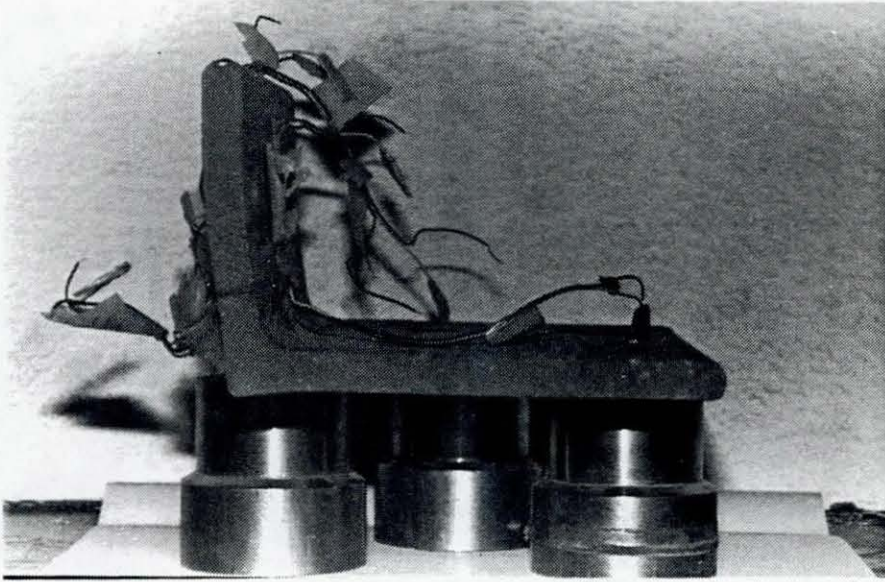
FLANGE ANGLE FROM SPECIMEN 14S2 AFTER TEST
